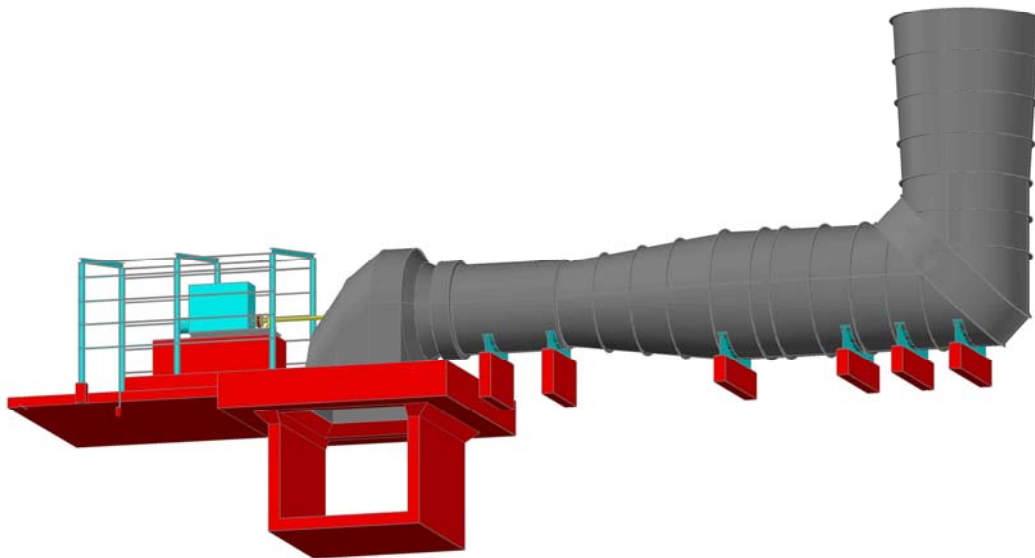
Typical possible layout of mixed-flow main fan installation
